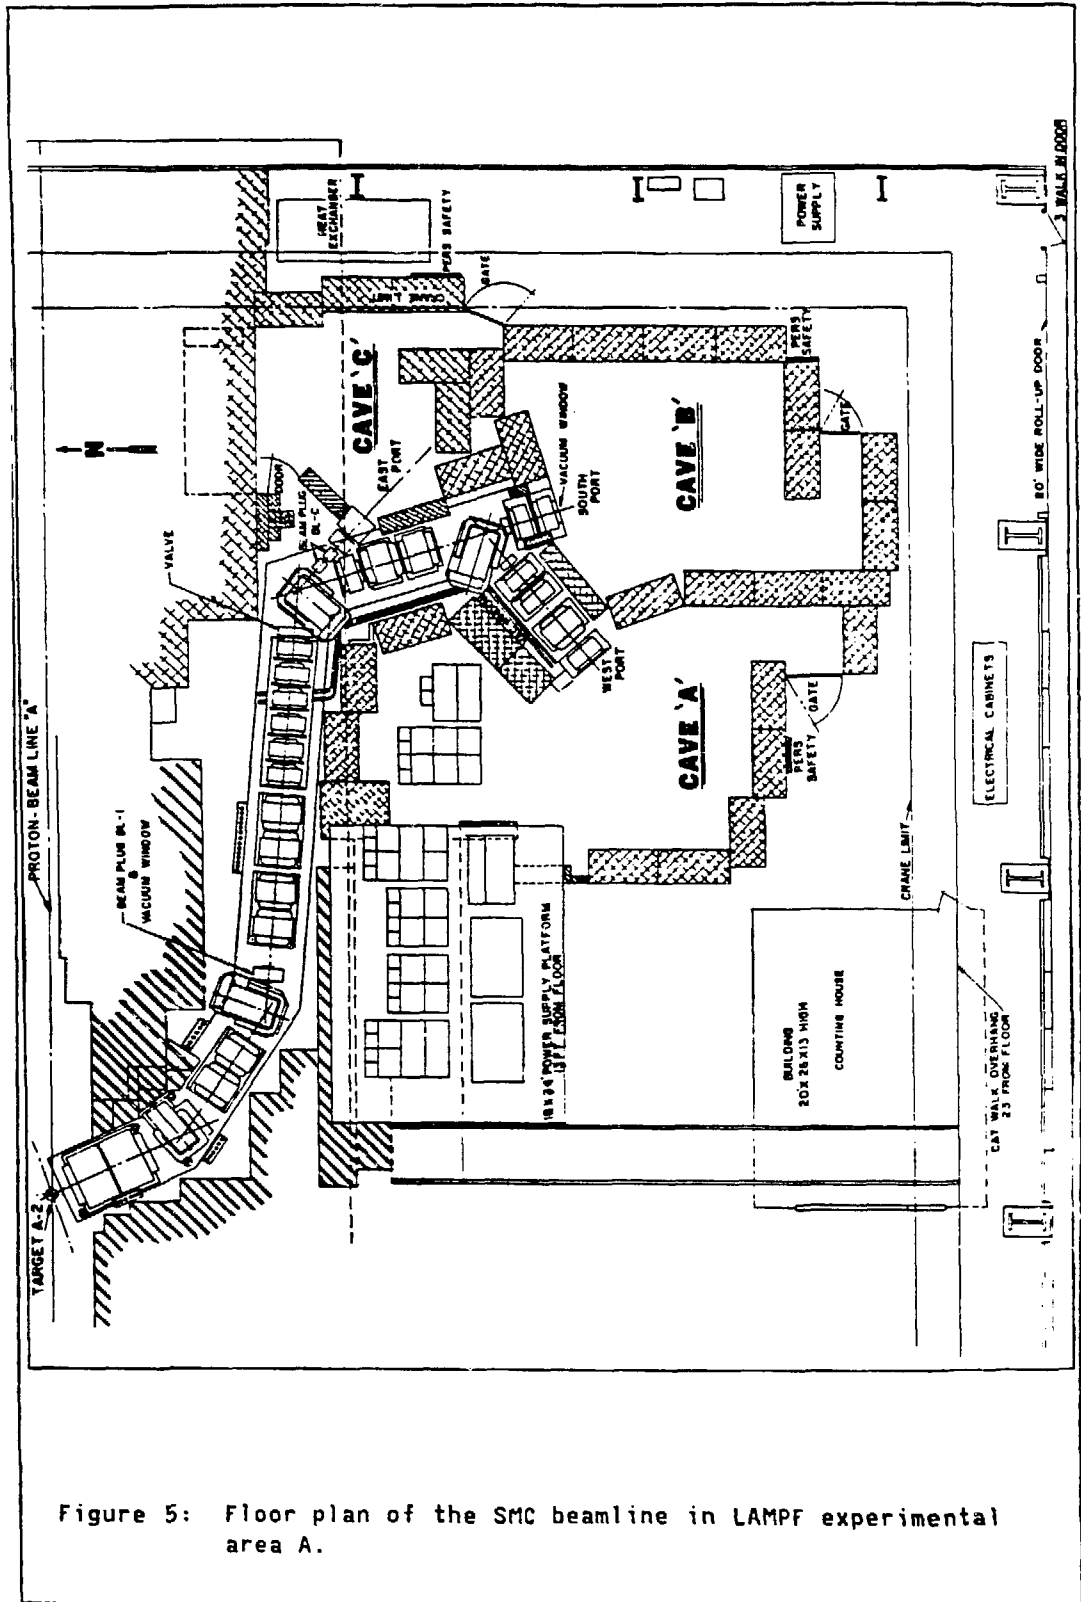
Floor plan of the SMC beamline in LAMPF experimental area A.
